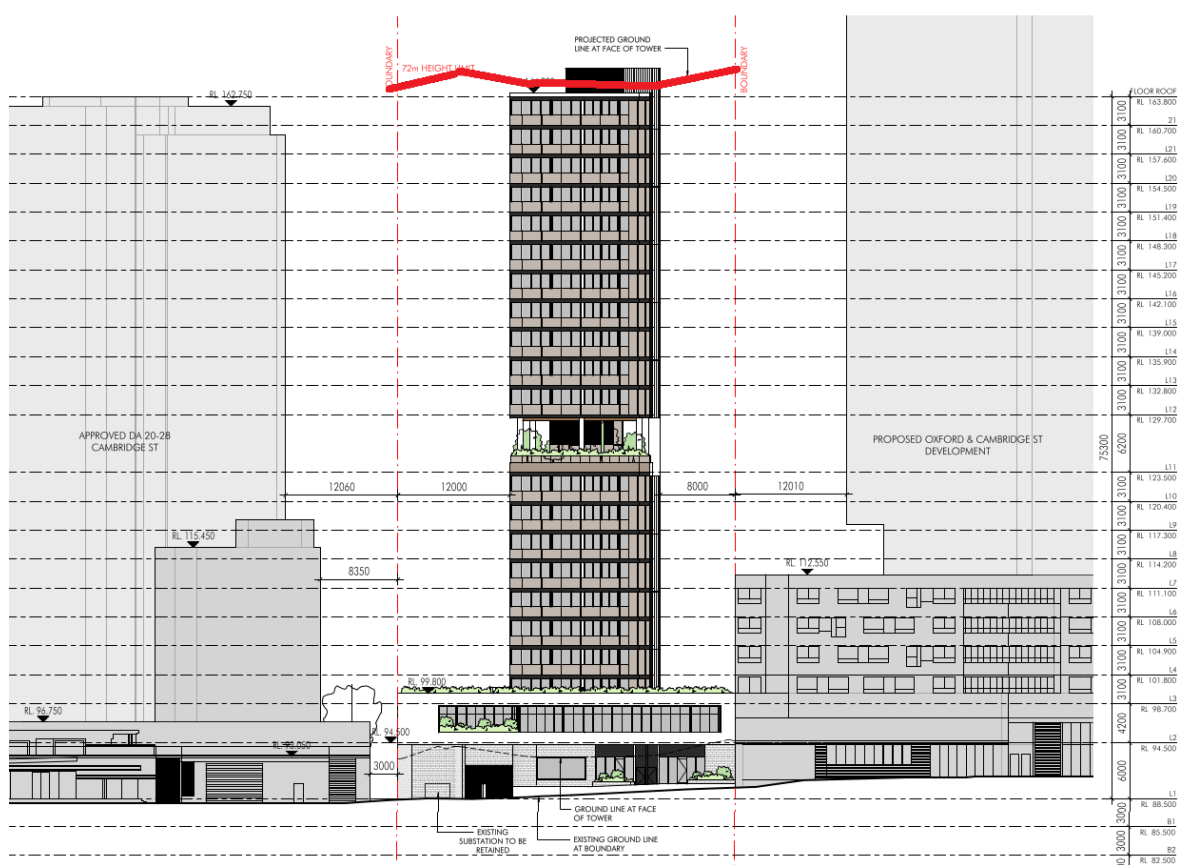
Extract of elevation drawing when viewed from the Western (Front) Elevation.
